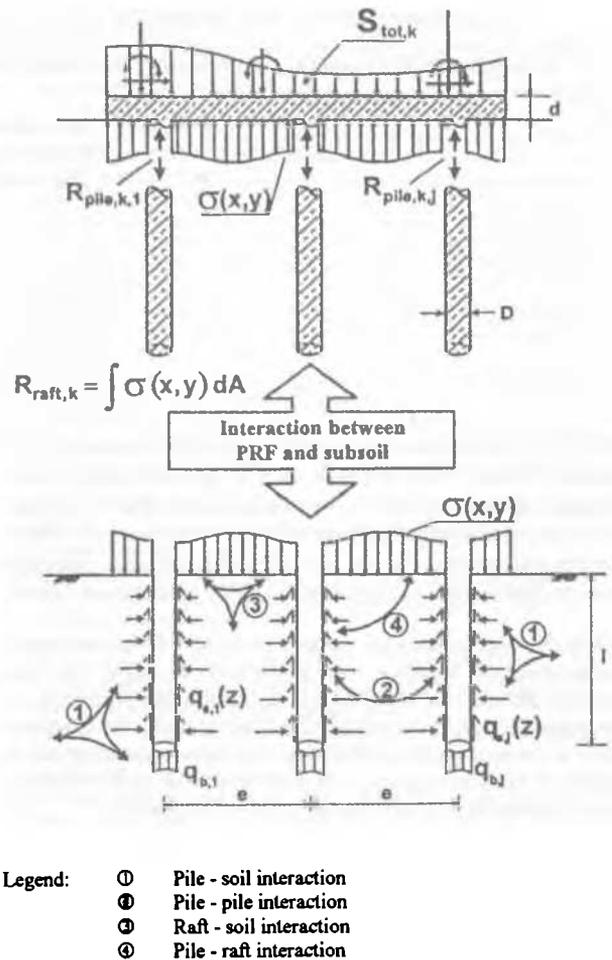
Piled raft foundation as a composite geotechnical structure and interaction mechanisms between the support elements and the ground which are relevant for the load bearing capacity of the PRF (out of Harnisch et al., 2000)
